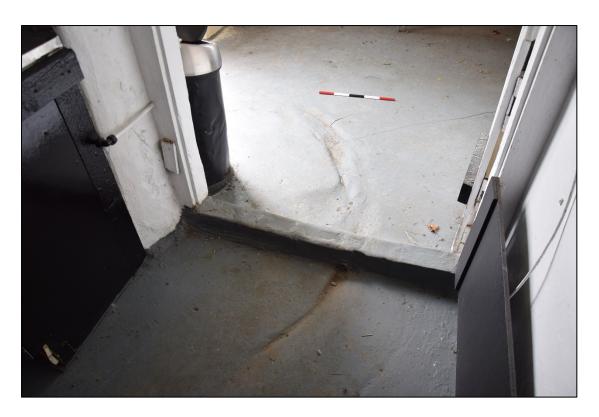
The lean-to formerly had a wide door that filled most of its south wall. A view looking north-east
